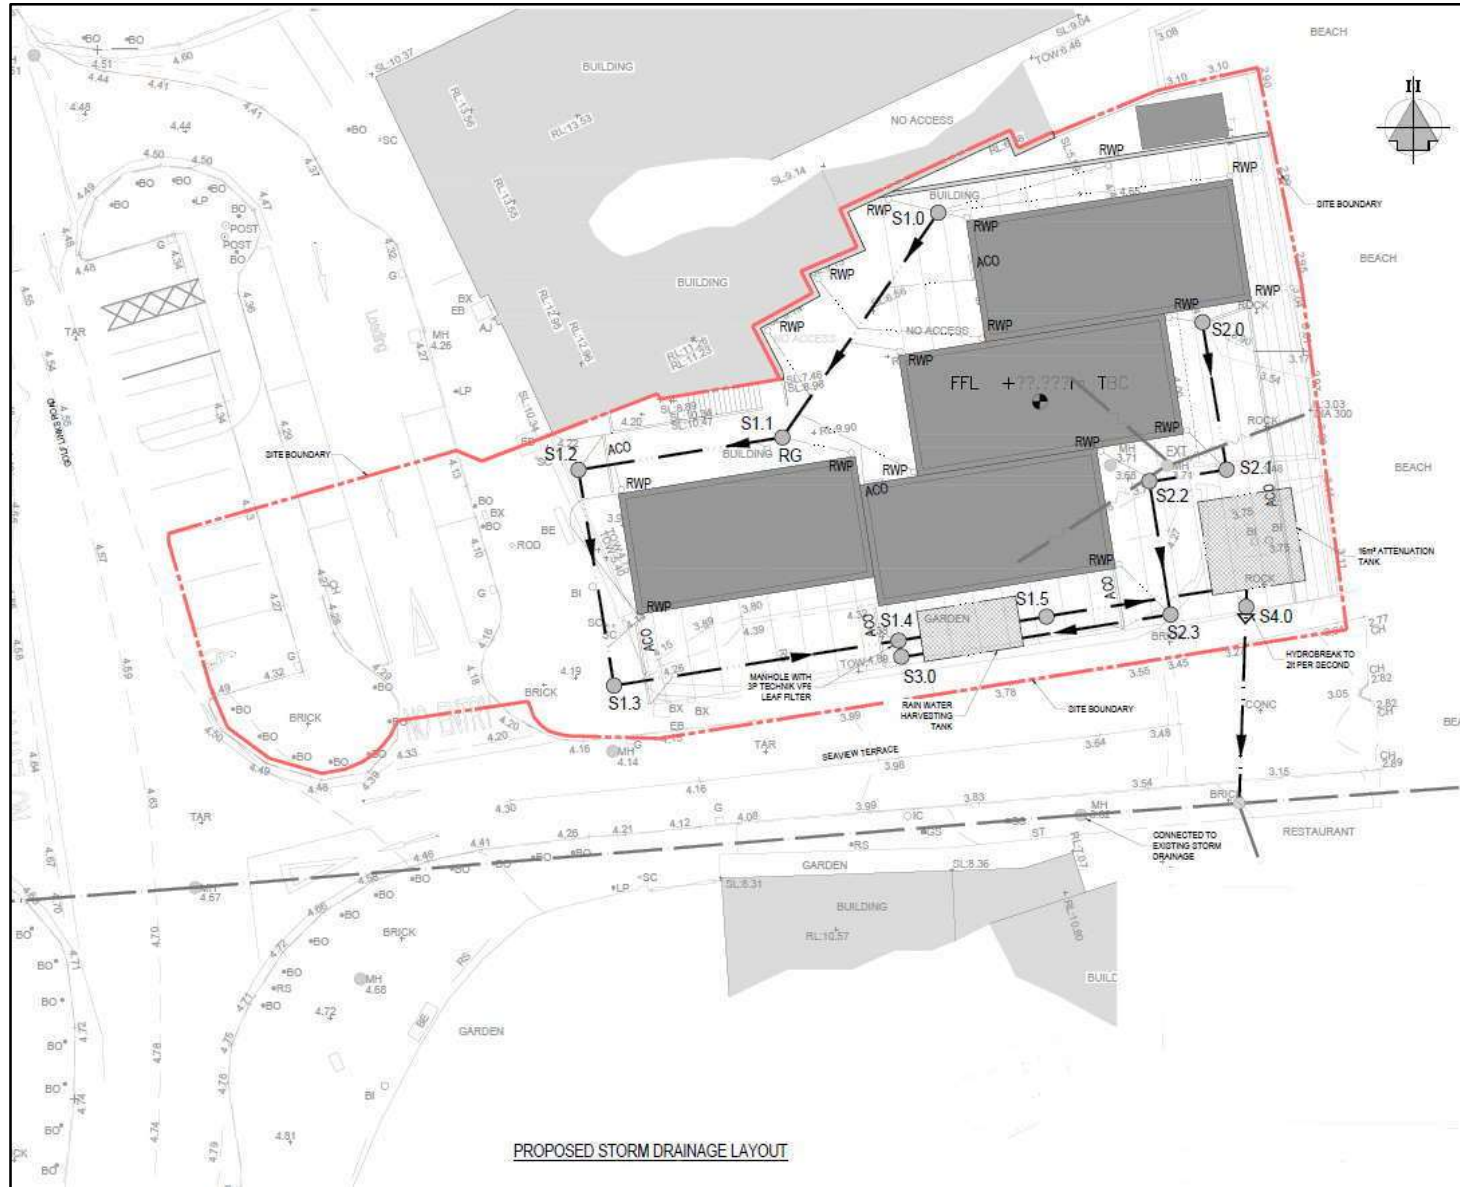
Site layout of the proposed development at Bettystown with indicative storm drainage layout.
